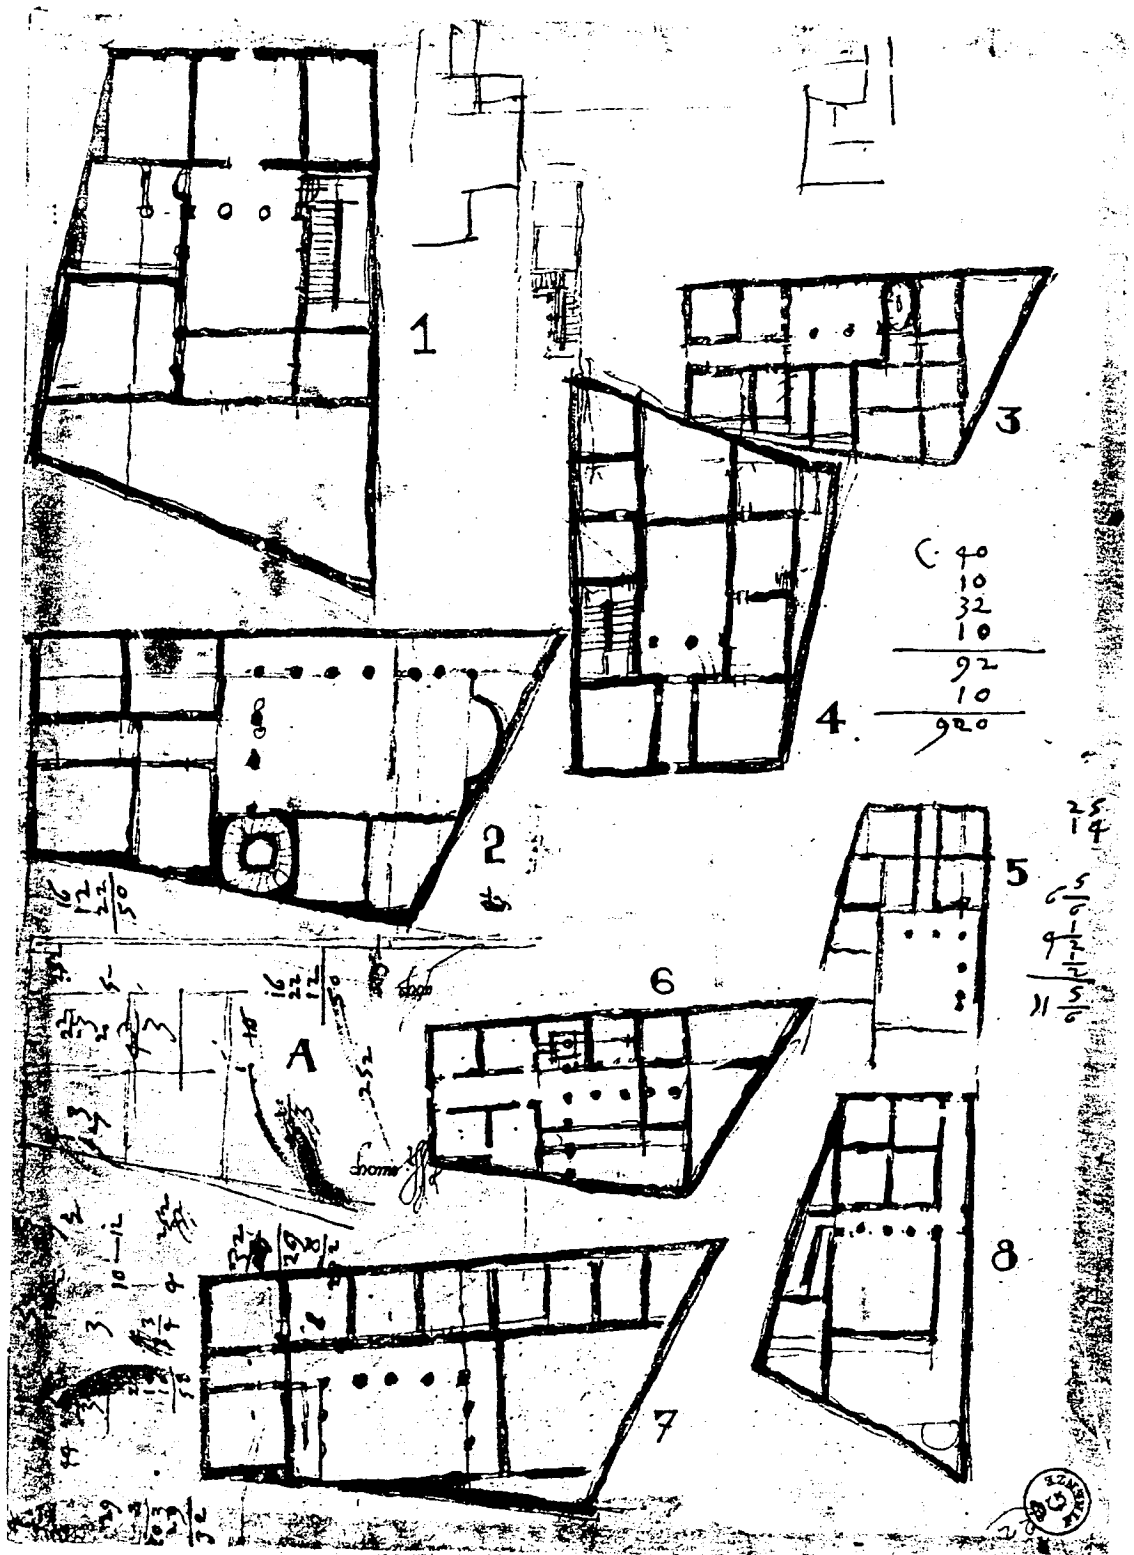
Baldassare Peruzzi: plan sketches for Palazzo Ricci (Uffizi 359)
